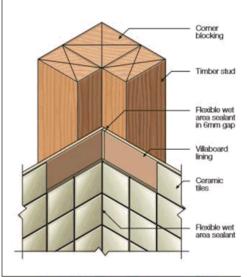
INTERNAL TILED CORNER - NON SHOWER AREA
